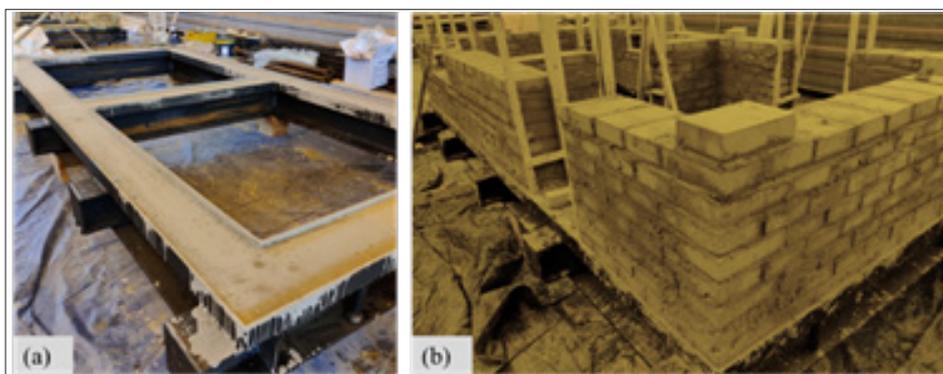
Plain concrete cast on the metallic frame (a) and bricklaying for building model (b)
